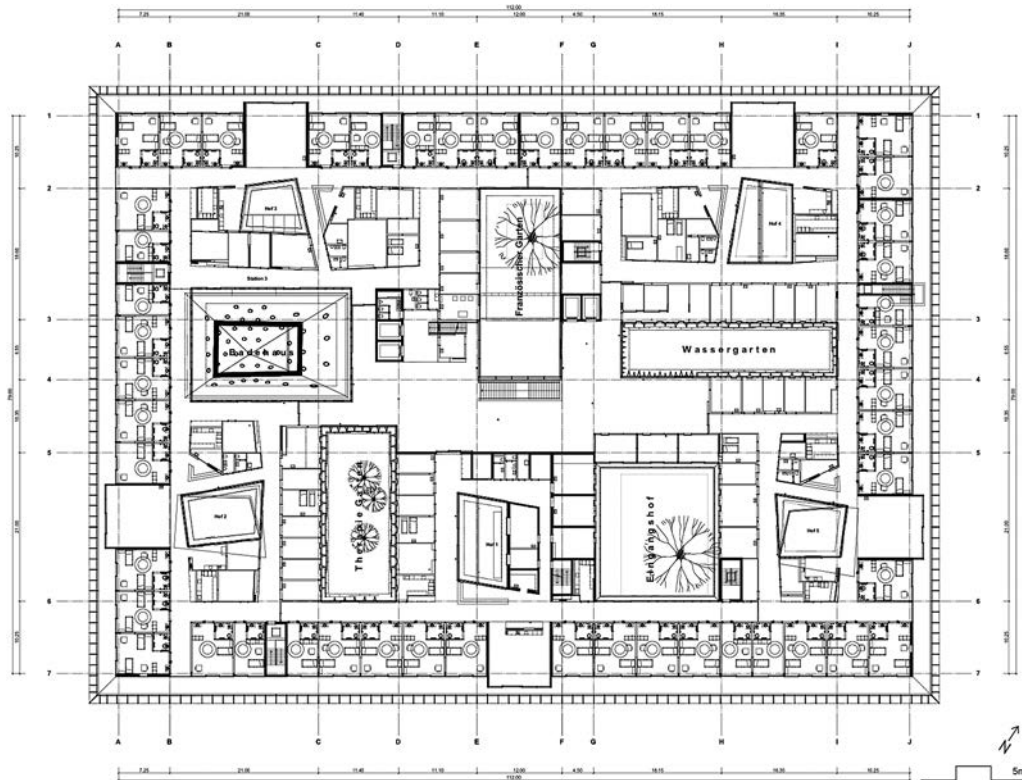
Second floor plan. Source: Copyright © Herzog & de Meuron
